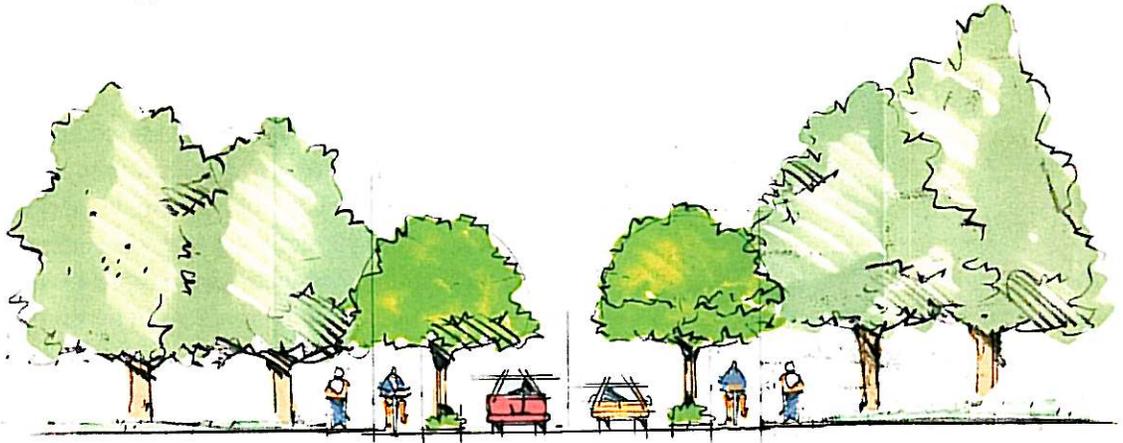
Alternative A — One-way bike lane with landscape separation on two sides. Maintains two vehicles travel lanes. Provides one-way directional bike lane on each side of the street. Existing pedestrian walkways remain. Landscape planters separate the bicycles and pedestrians from vehicular traffic, provide shade, and reduce the scale of the street.
